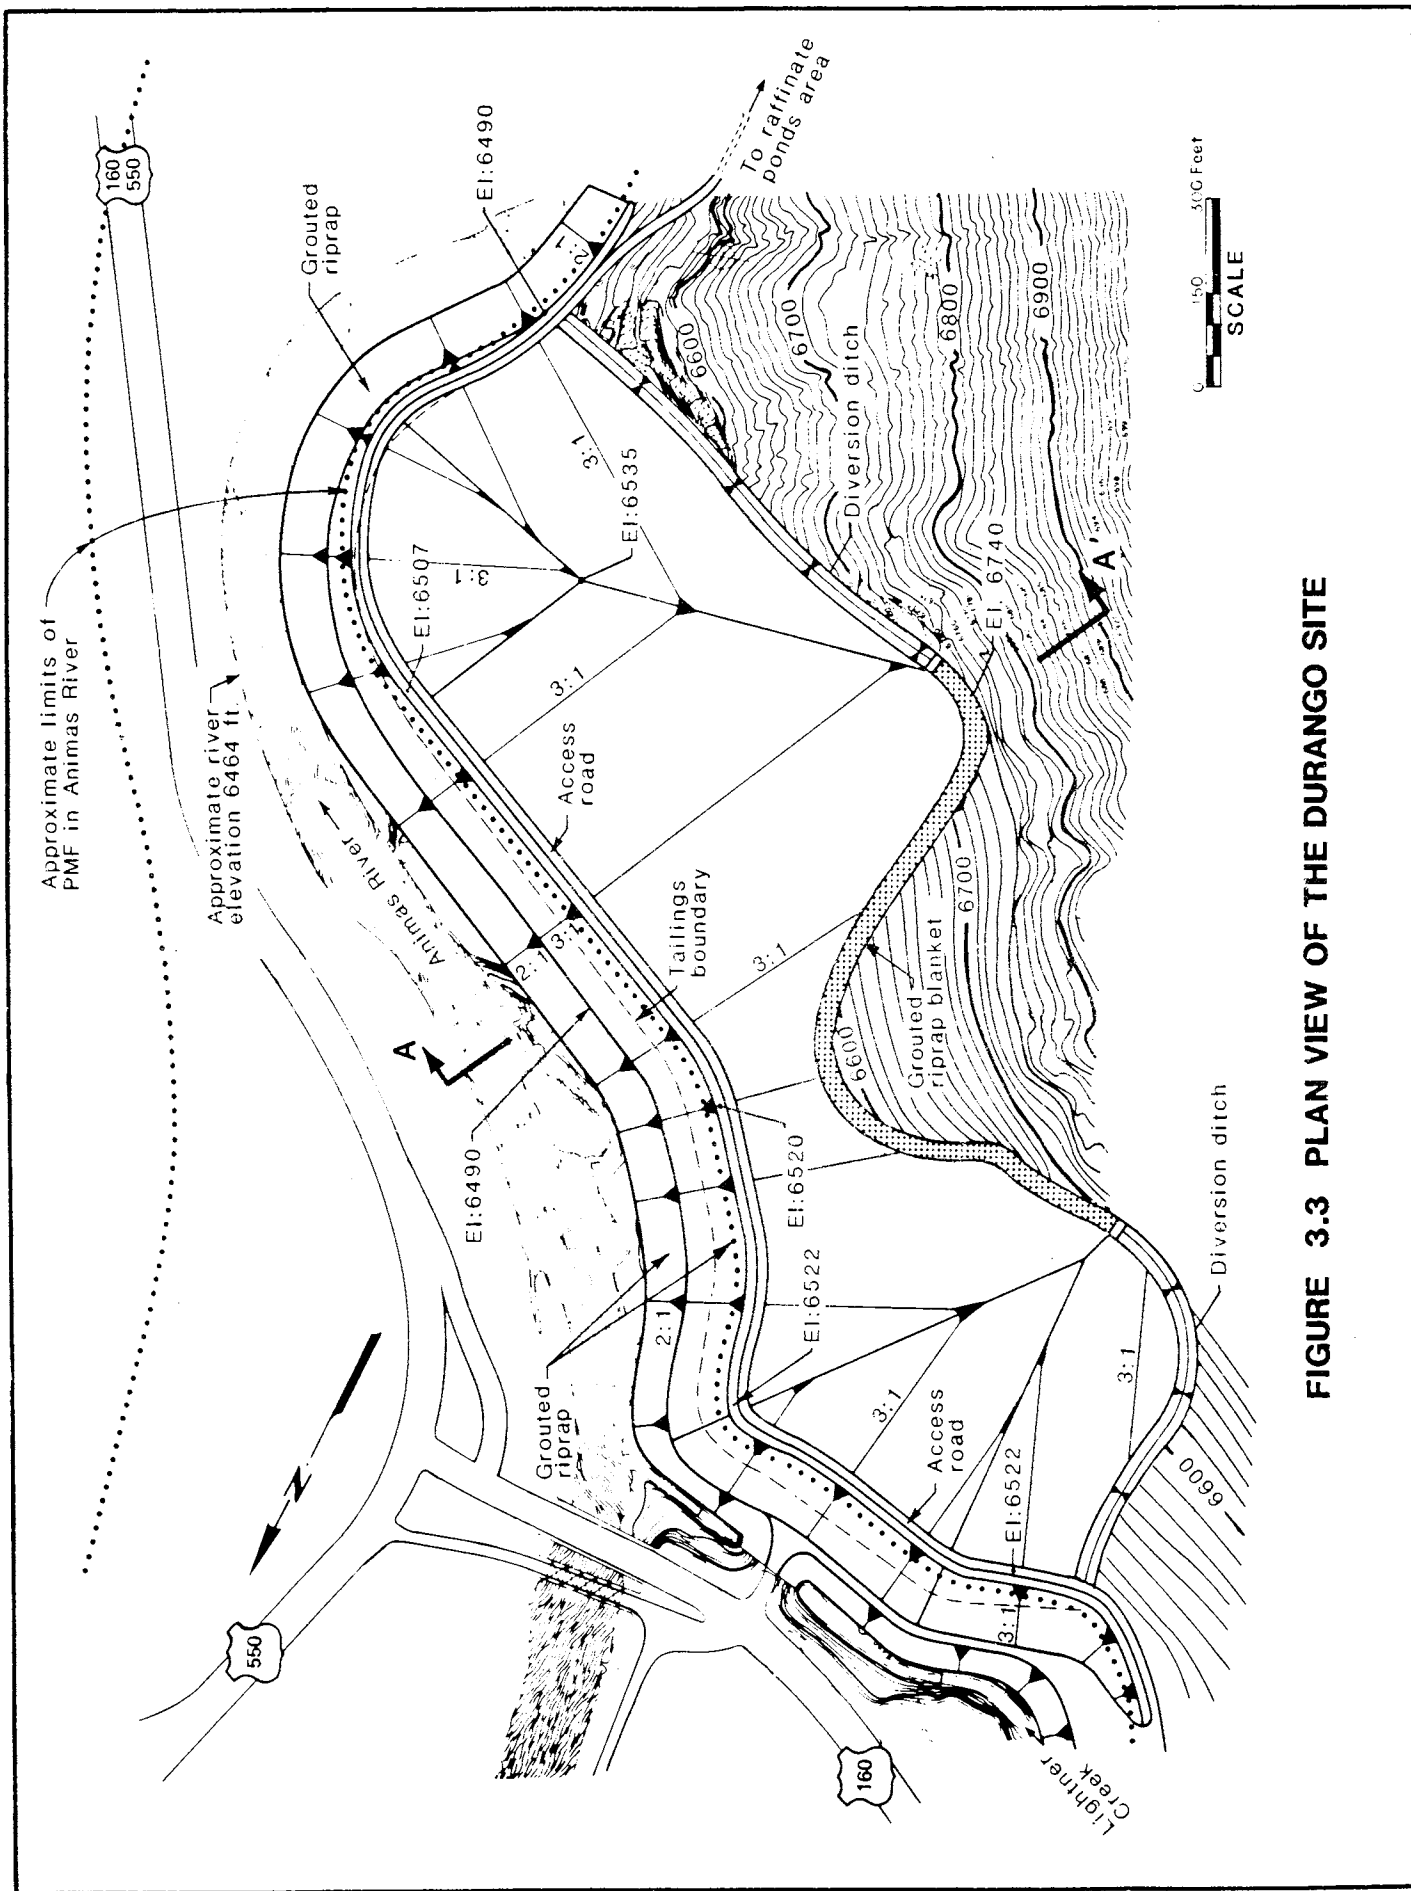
PLAN VIEW OF THE DURANGO SITE
